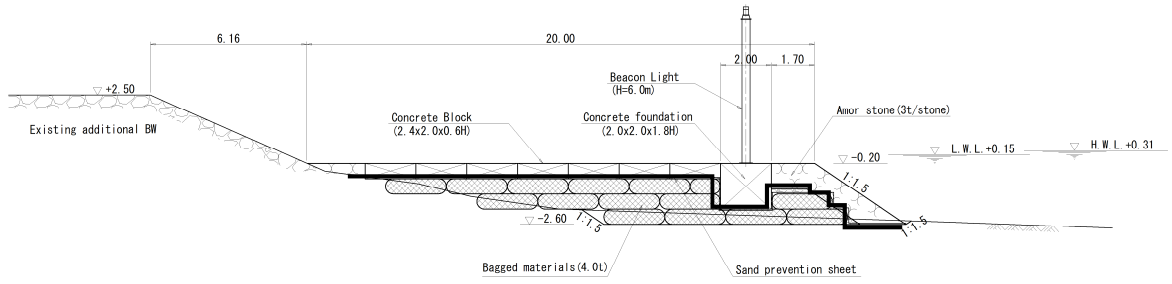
(5) Longitudinal cross section drawing of submerged breakwater (completed)
